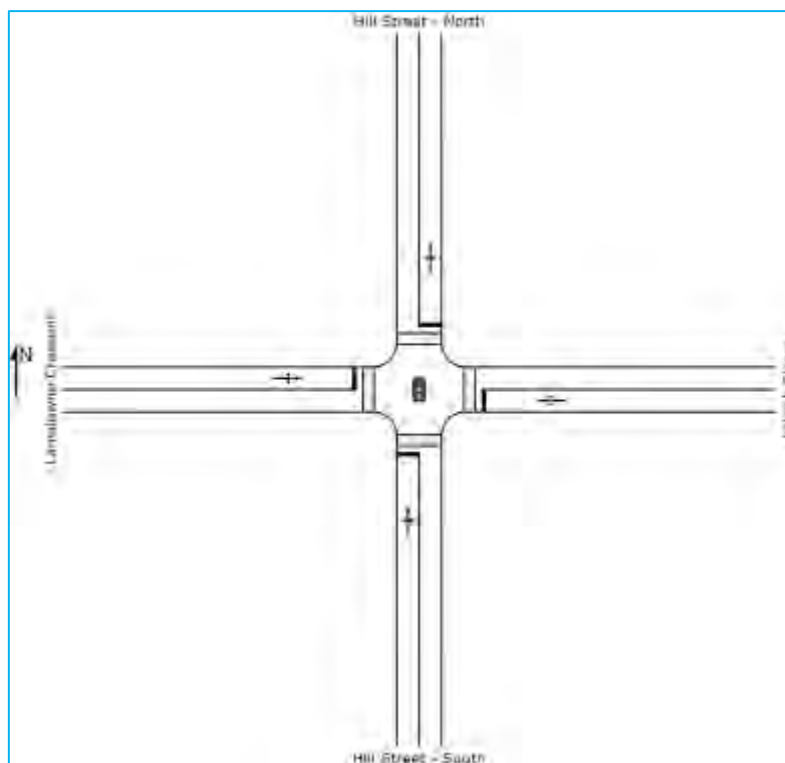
Lansdowne Crescent, Hill Street and Patrick Street Signalised Intersection Layout
